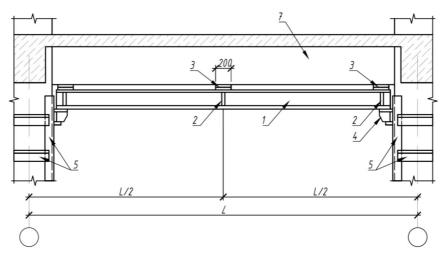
Strengthening of the reinforced concrete beam with the steel beam resting on the piers
